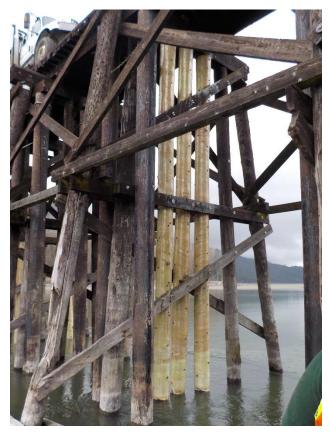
High-strength fibre pile wraps on a railroad trestle in British Columbia. Traditional repair methods would have been impractical on this structure. Driving new piles would have been cost prohibitive and would have required extended bridge closures, and posting multiple piles within a single bent is not recommended, as lateral resistances is significantly reduced.
